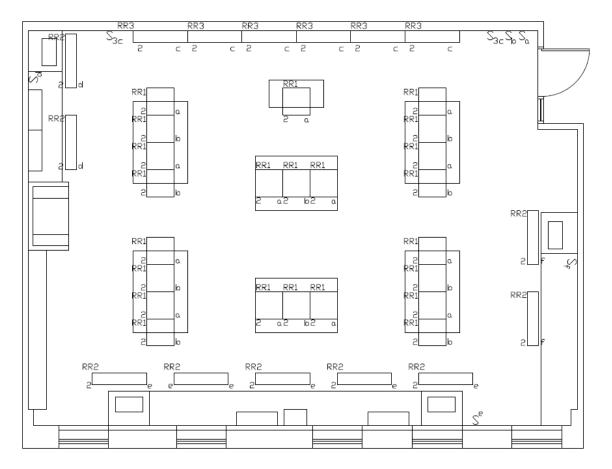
Lighting Plan – Ecology Teaching Lab
